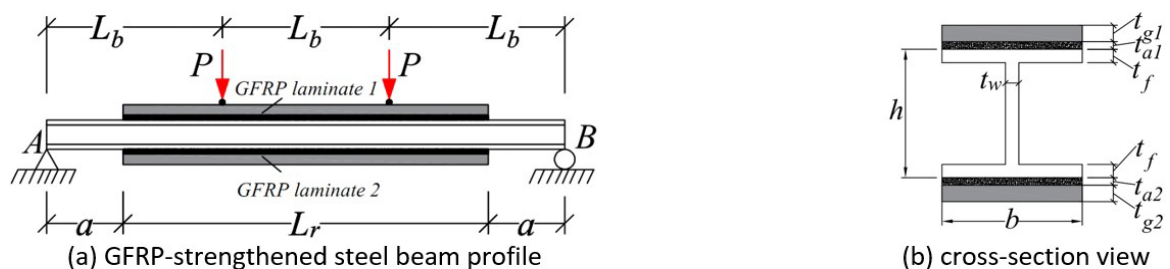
Simply supported steel beam strengthened with two GFRP laminate subjected to point loads (El Damatty et al. 2003)
